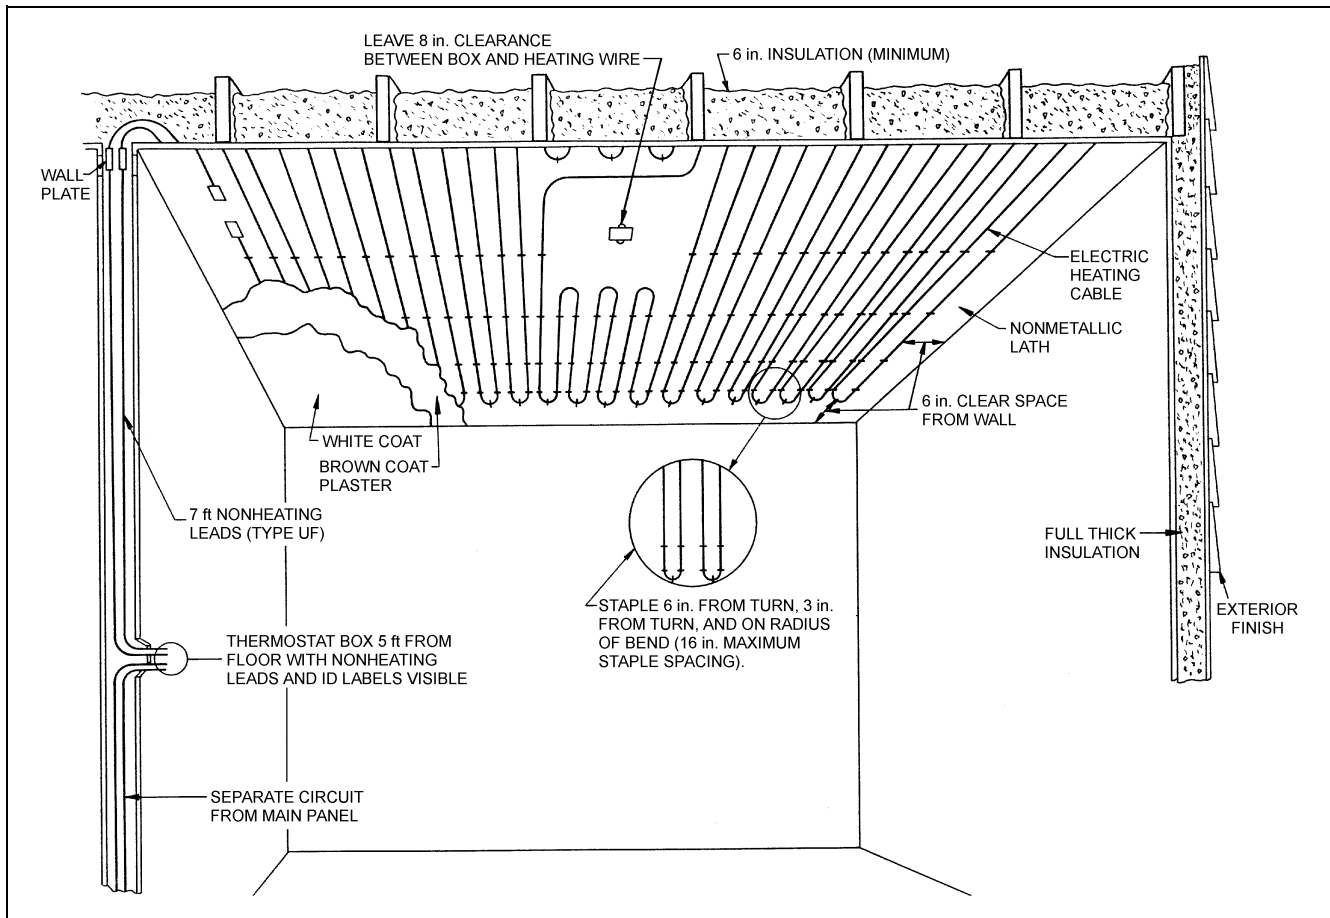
Electric Heating Panel for Wet Plaster Ceiling
